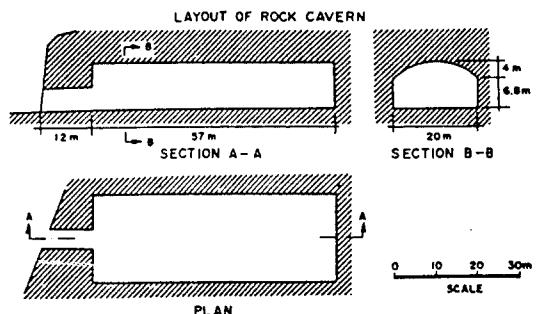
Cross-section of underground cold storage of food at Bergen.
